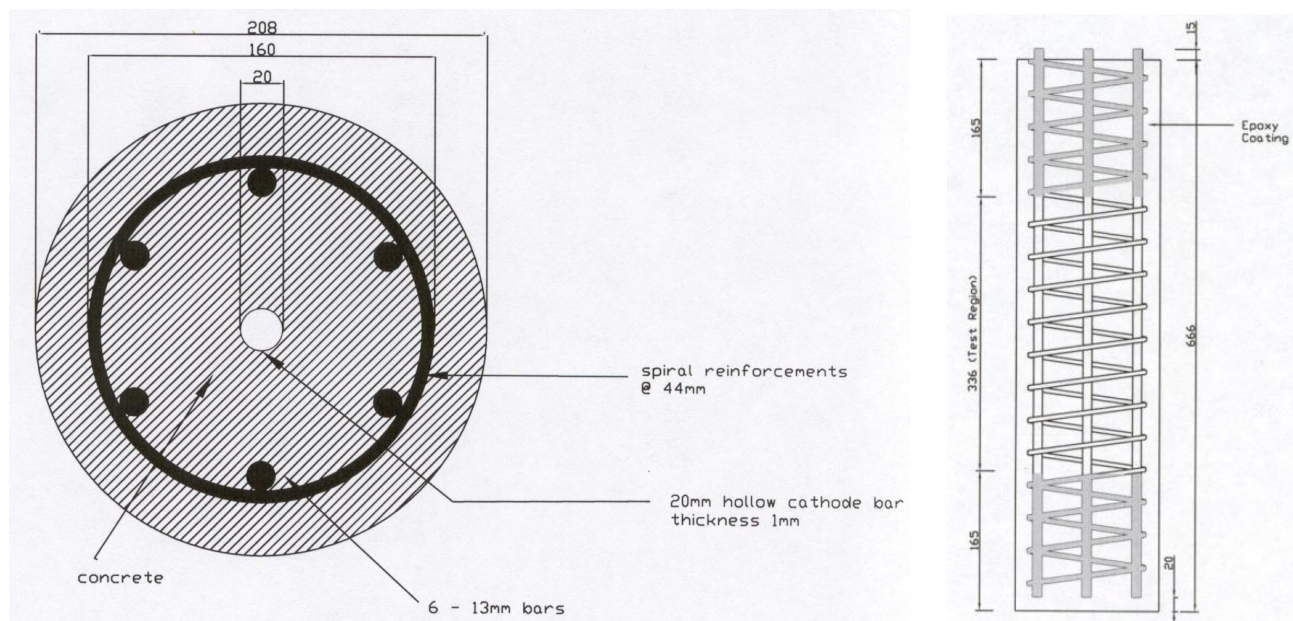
Cross sectional details and overall dimensions of a typical specimen [24].
